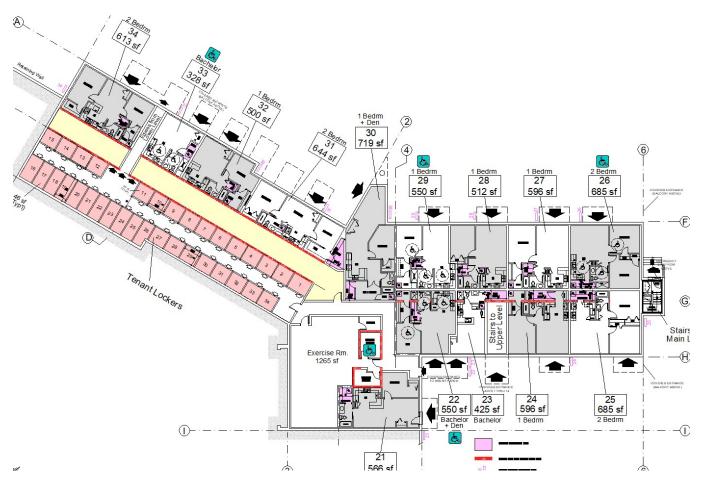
Schematic Lower Level Floor Plan of Proposed New 34 Unit Adaptive Re-Use
